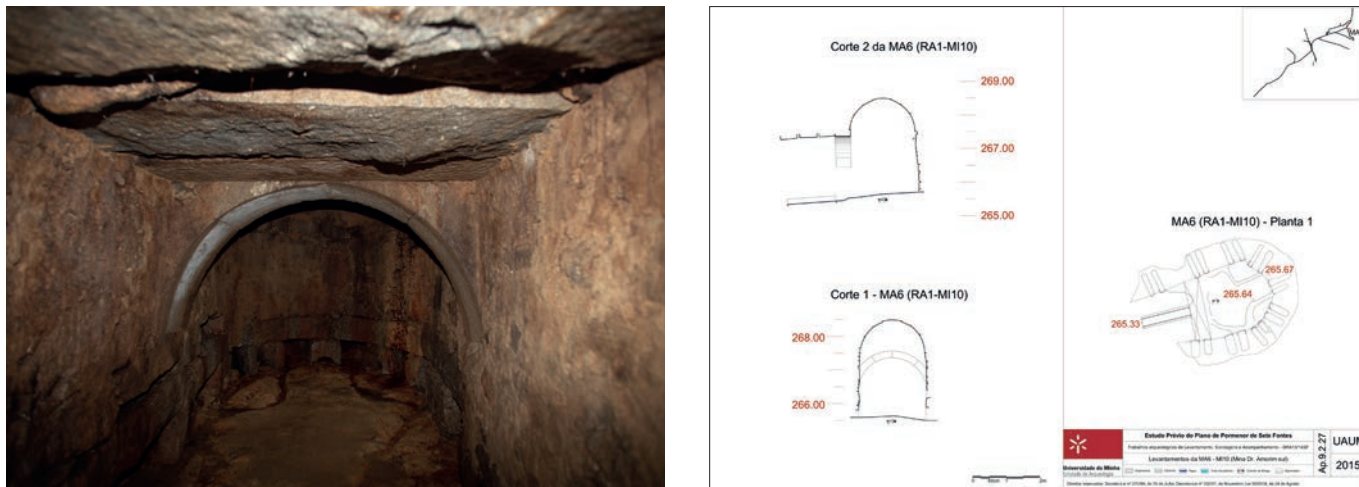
Dr. Amorim Sul's head of water of (MA.6) - Interior view; elevations and plan. © UAUM
